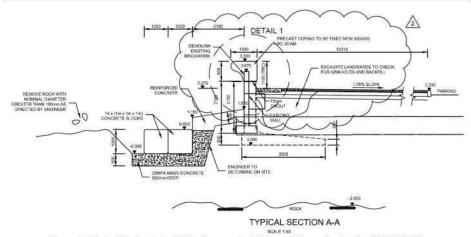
Typical Section A-A at Bart's Corner, refer to Figure 10 for section location (MMD, 2013).
